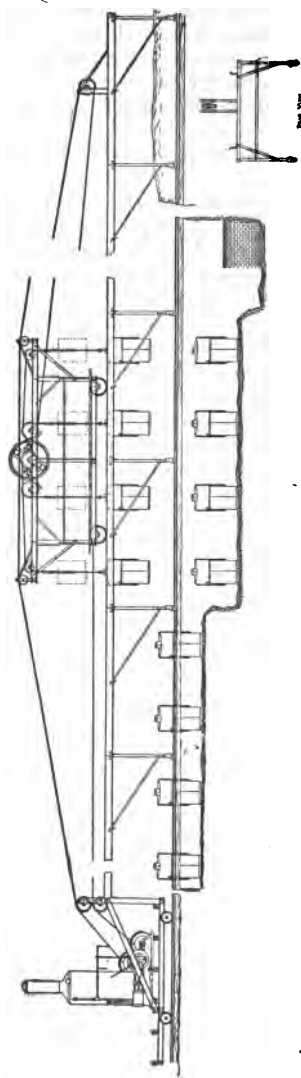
Potter Improved Four-Bucket Hoister and Conveyor Trench Machine.
